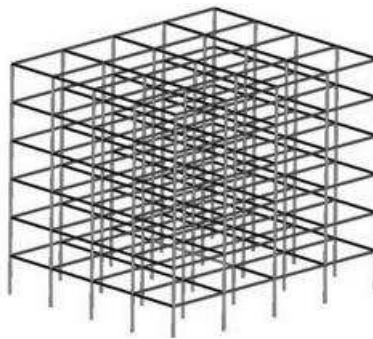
The 6-Storey Reinforced Concrete Building Structure Specimen.
